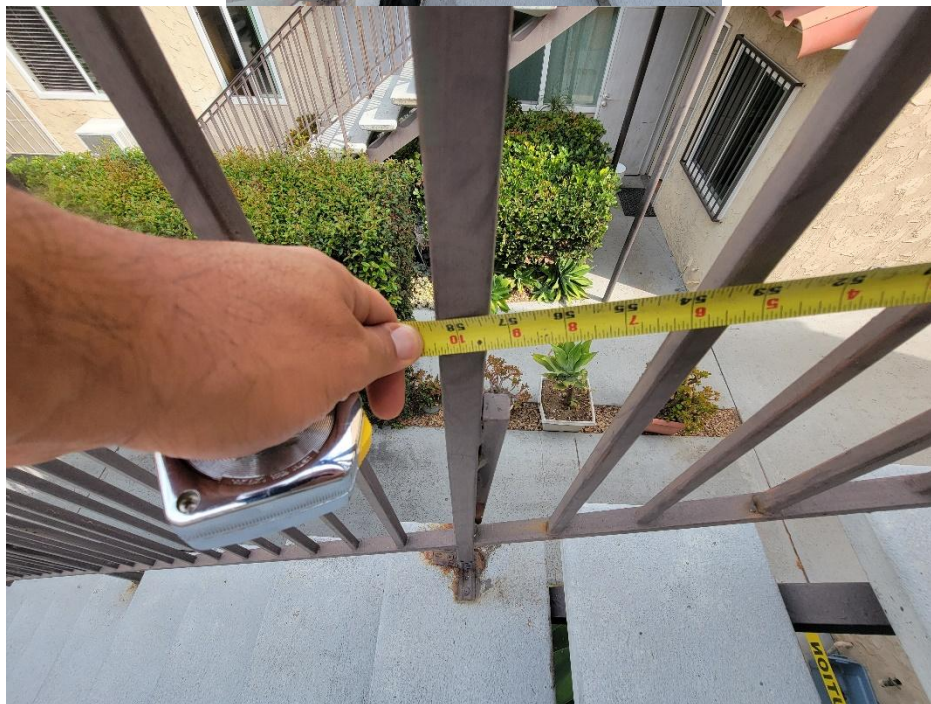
View of stair and landing railing posts anchorage showing corroded post base post and anchorage to the cracked concrete topping which the railing is wobbly and unsafe
